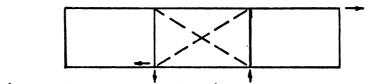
X-BRACED FRAME (diagonals in tension; verticals in tension or compression).
